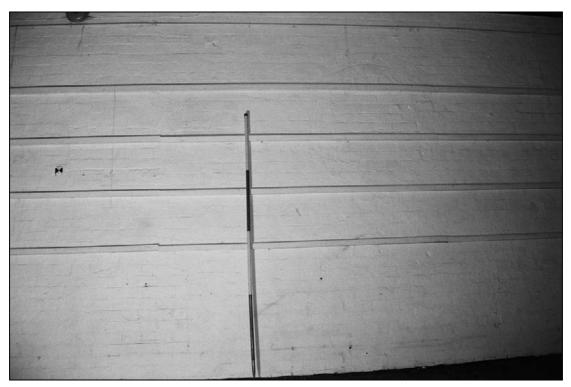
Detail of blocked arched openings within the south wall of G20, south range (west end) (film 21.35)
